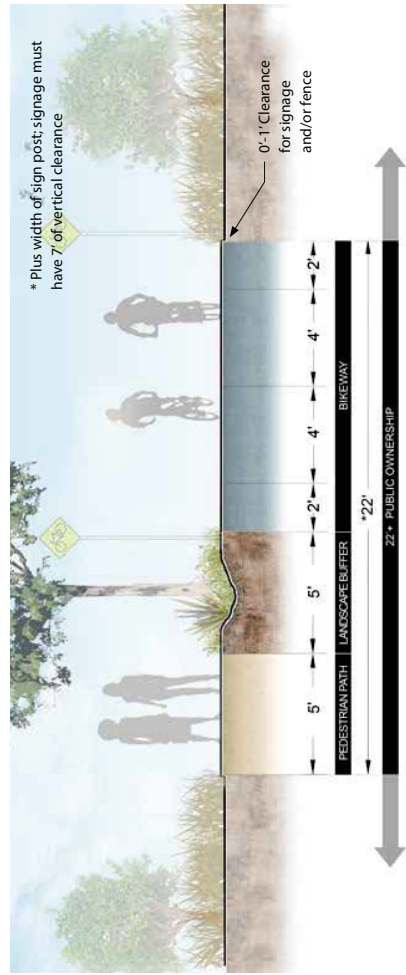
Burbank Boulevard Sepulveda Boulevard (Through Sepulveda Basin) - Typical Cross Section
